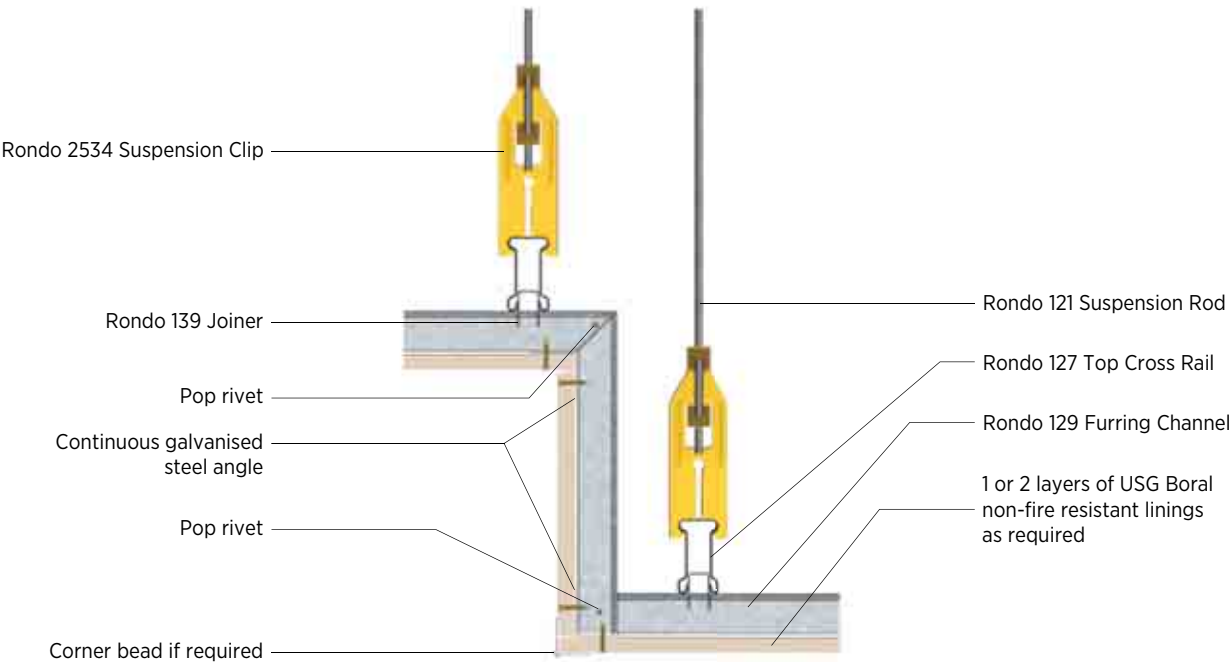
Typical Bulkhead Detail - Section Through Top Cross Rail
